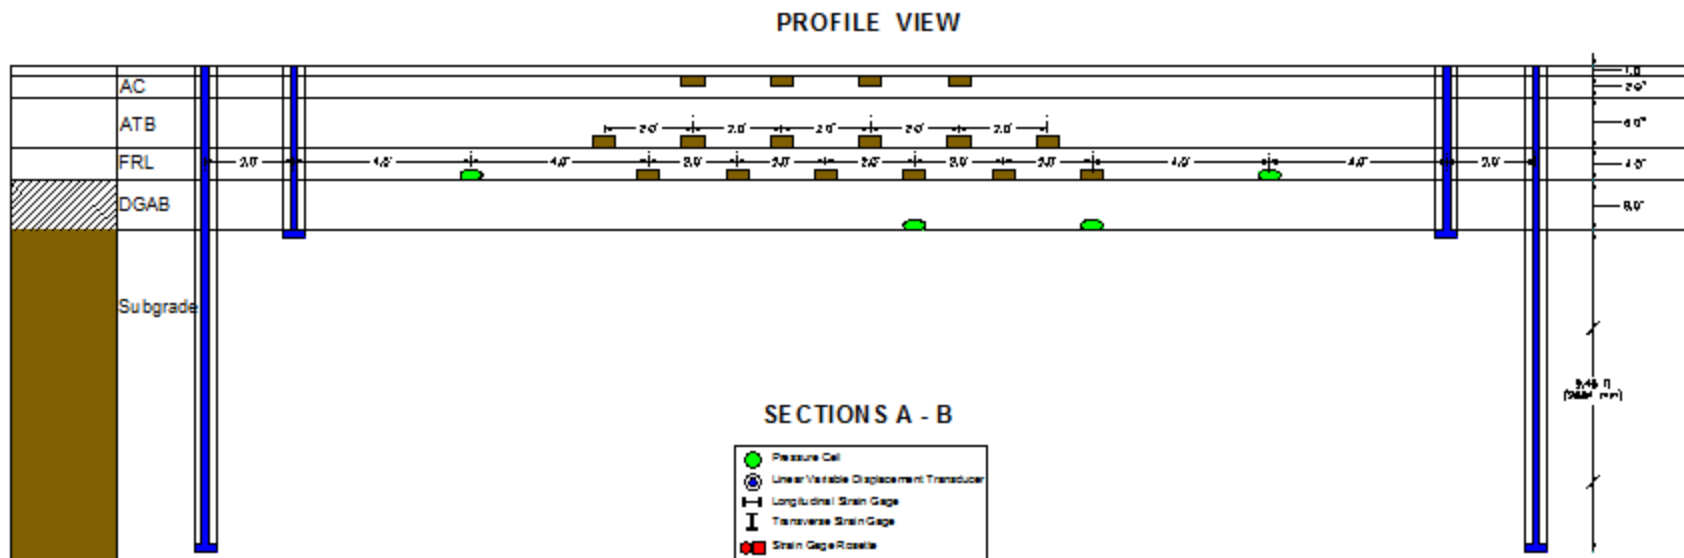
Illustration. Profile view of pavement structure and instrumentation of Sections A and B (13-in-thick).
